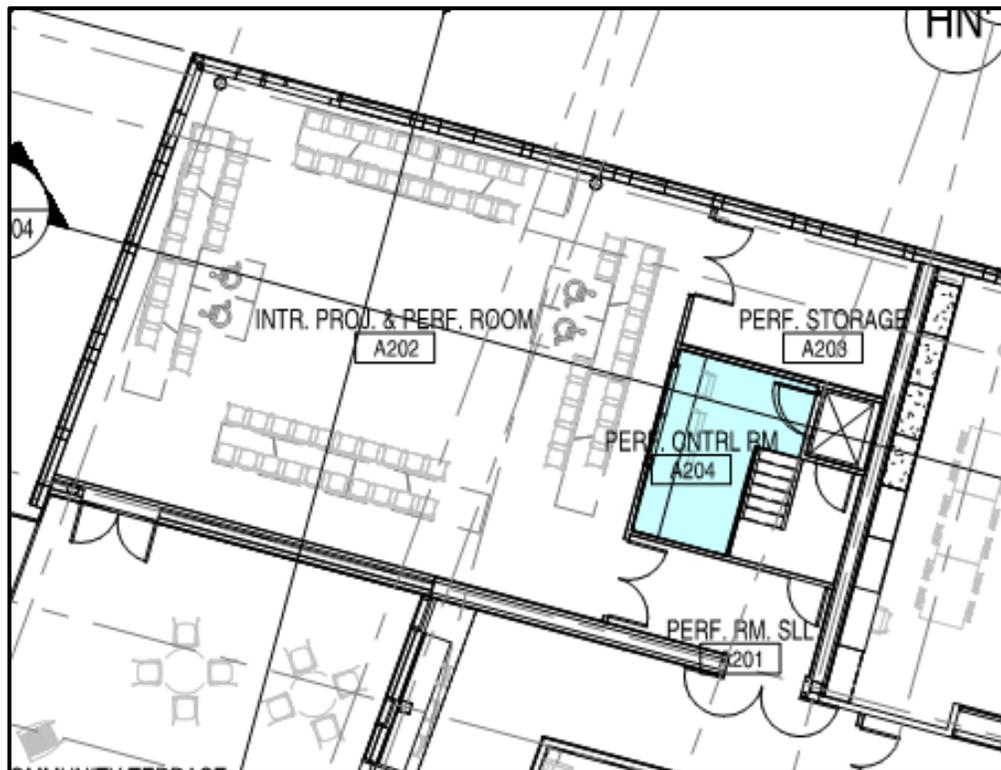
CONTROL BOOTH FLOOR PLAN
